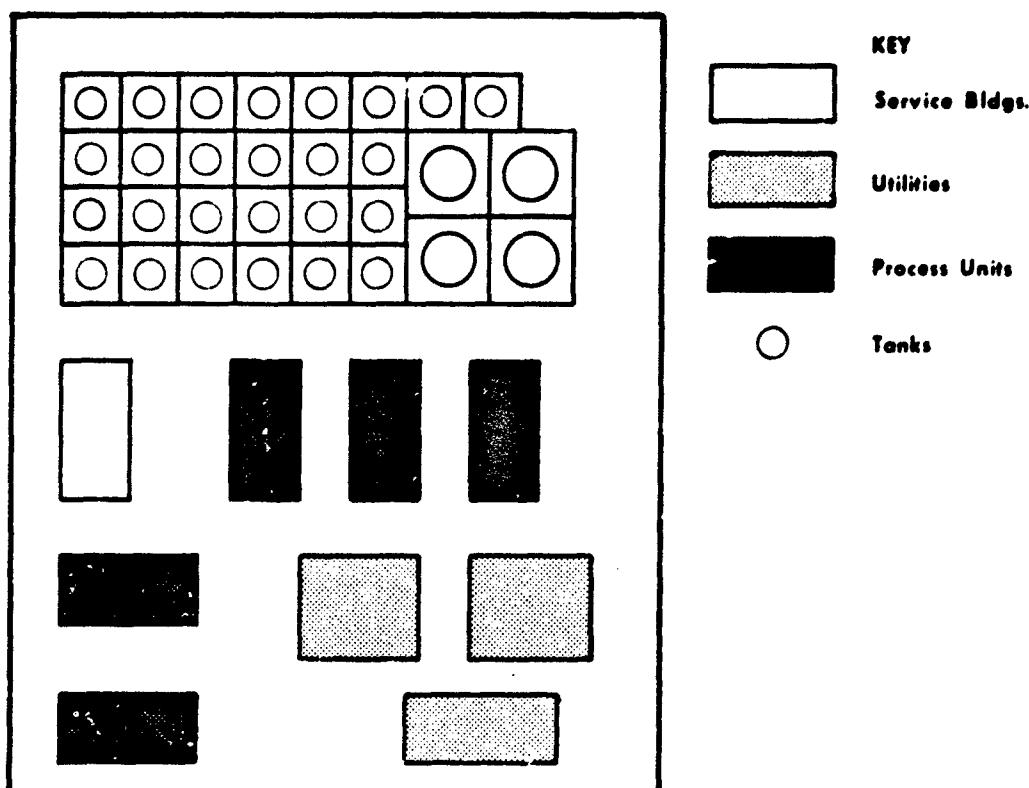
Illustrates a good refinery layout. The various elements of the plant are well separated. Insurance underwriters would be willing to assume a much greater dollar amount of insurance on this plant than on the previous one.
